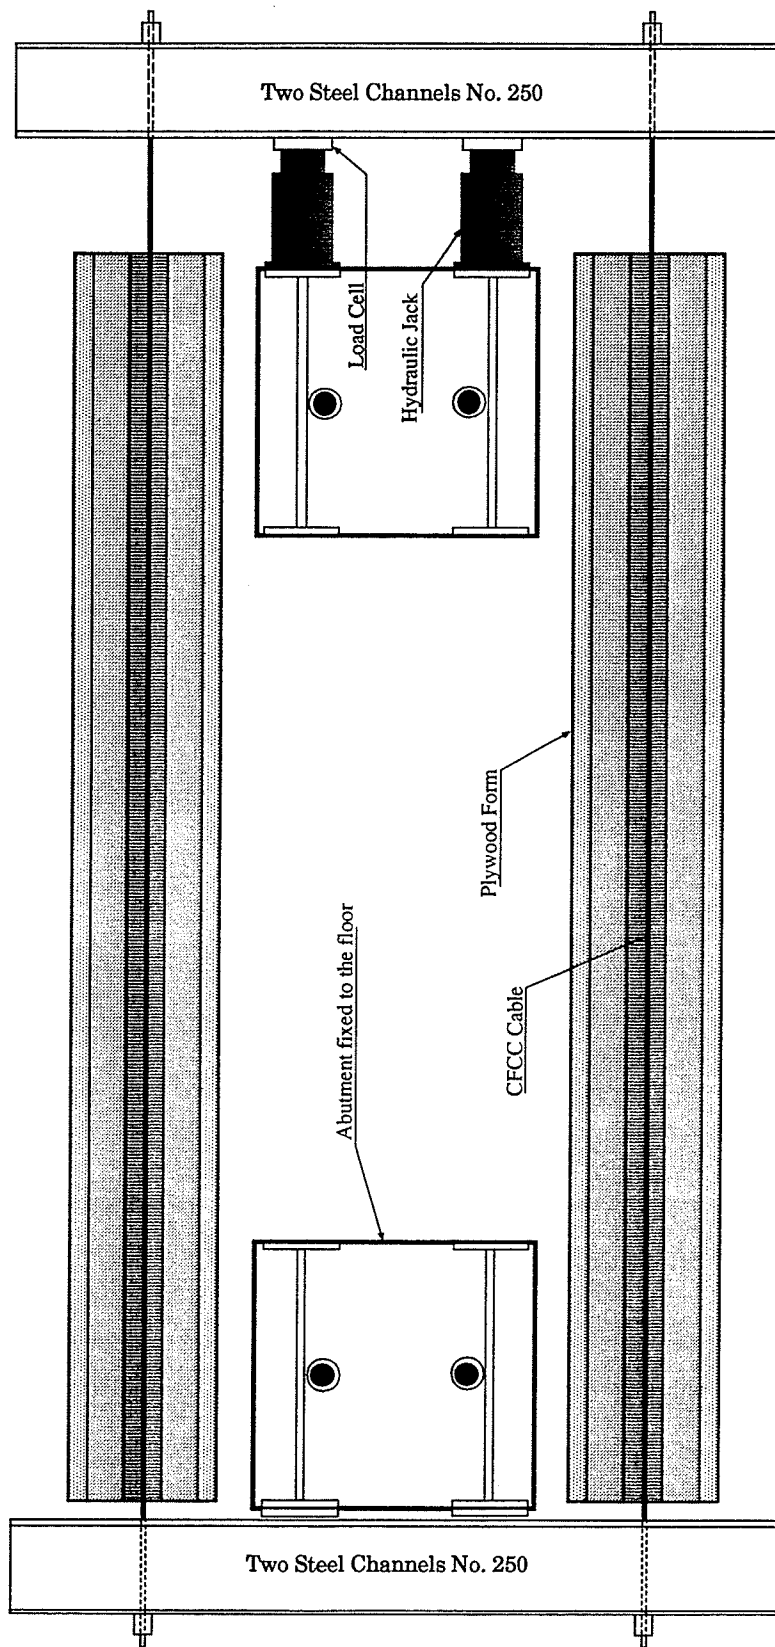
Plan of Prestressing and Casting Setup For Two Beam Specimens
